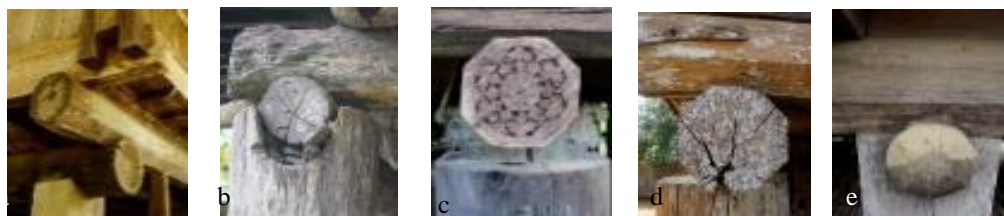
(a) full lap joint without pin (b) half-lap joint (c) one component notch lap joint (d) full lap joint with rope
